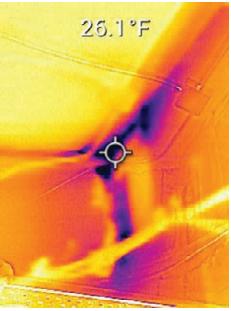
&4 Interior ceiling plenum at Front Desk – heat loss at beam pocket.
